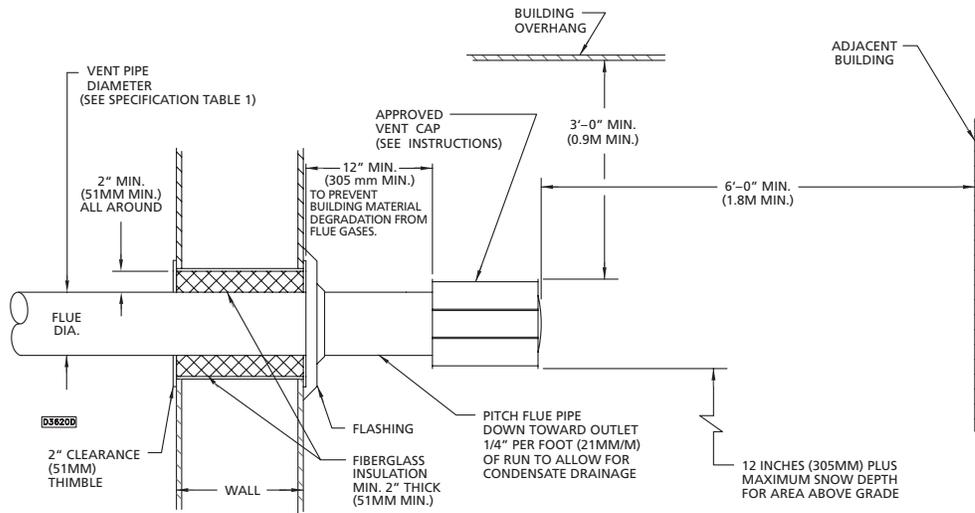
A – Horizontal Arrangement – Single Wall Vent System to Single Wall Termination
